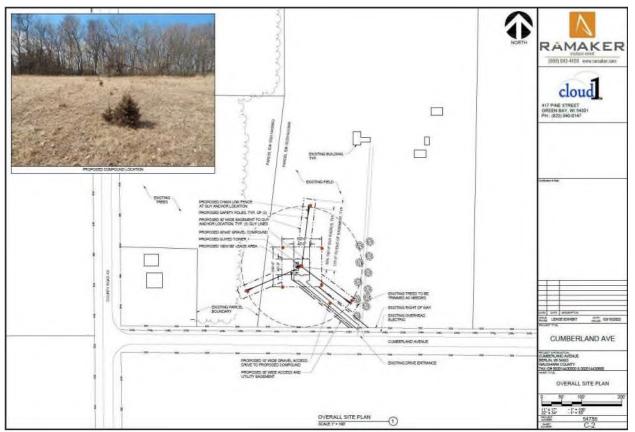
Site plan of the proposed tower compound and access road/utility easement with shovel tests in red.
